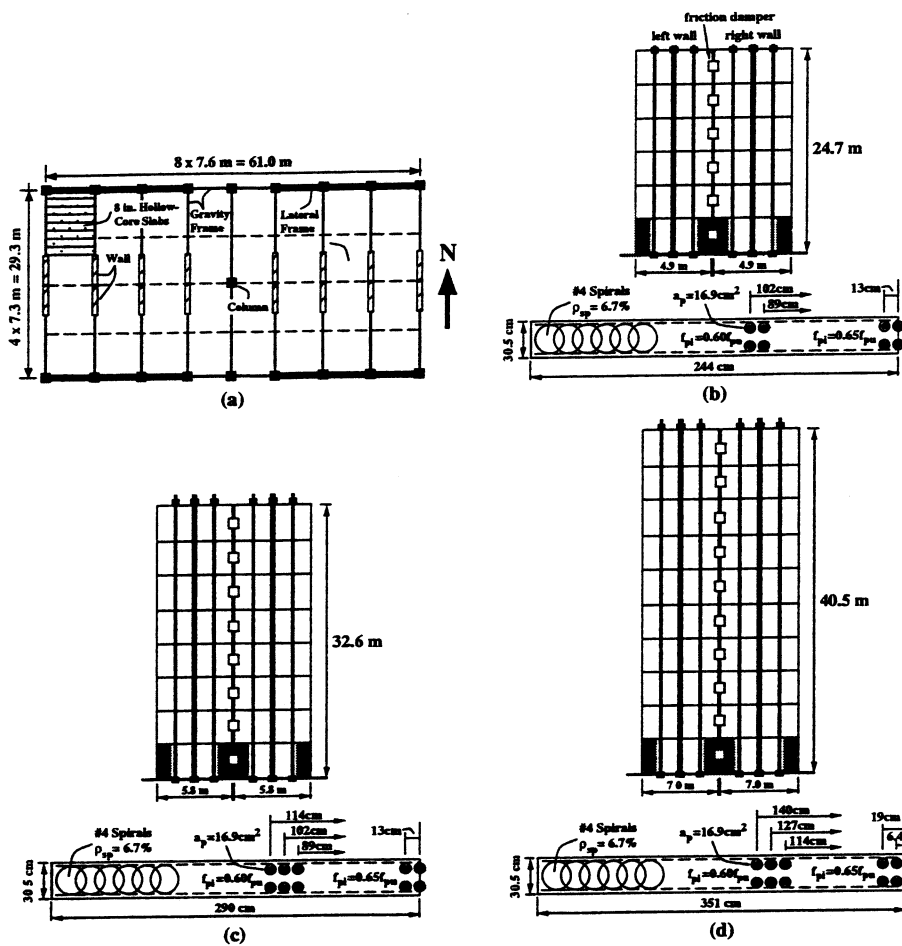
Prototype buildings: (a) plan layout; (b) Wall CW1; (c) Wall CW2; (d) Wall CW3
